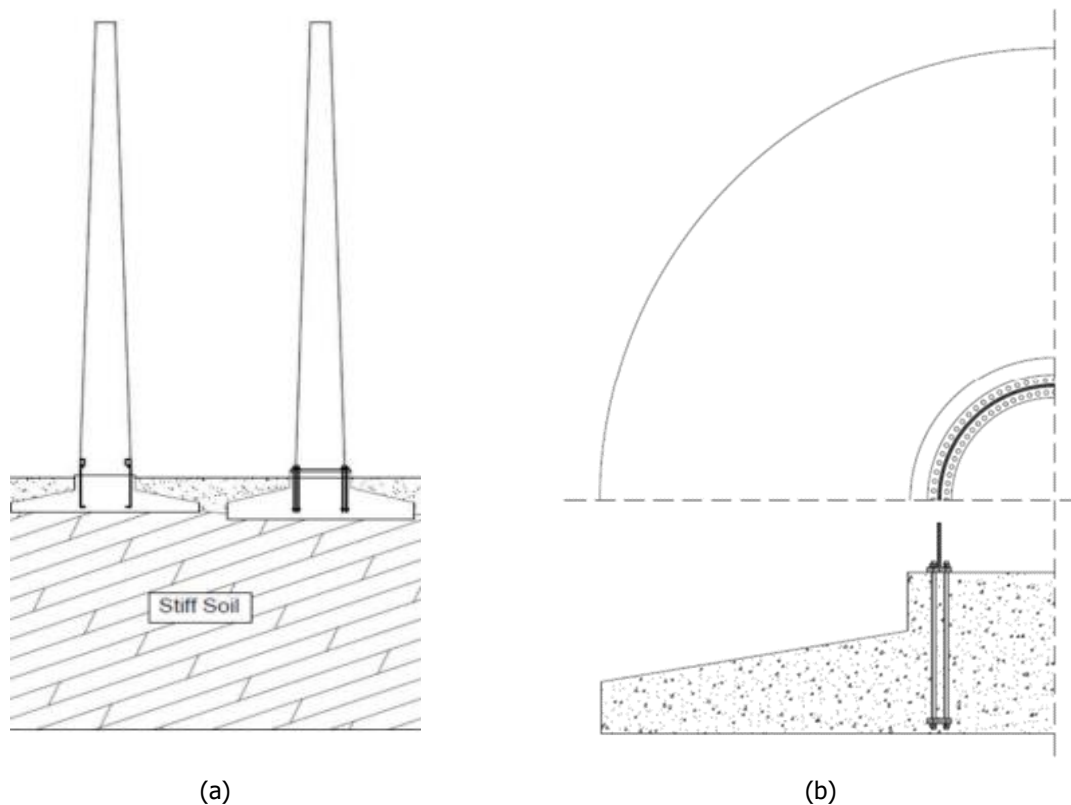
Tower connection to gravity-based substructure (a) ways to anchor tower bottom flange into concrete (b) detail of the "bolt cage" system (Stavridou, Efthymiou, & Baniotopoulos, 2015)
